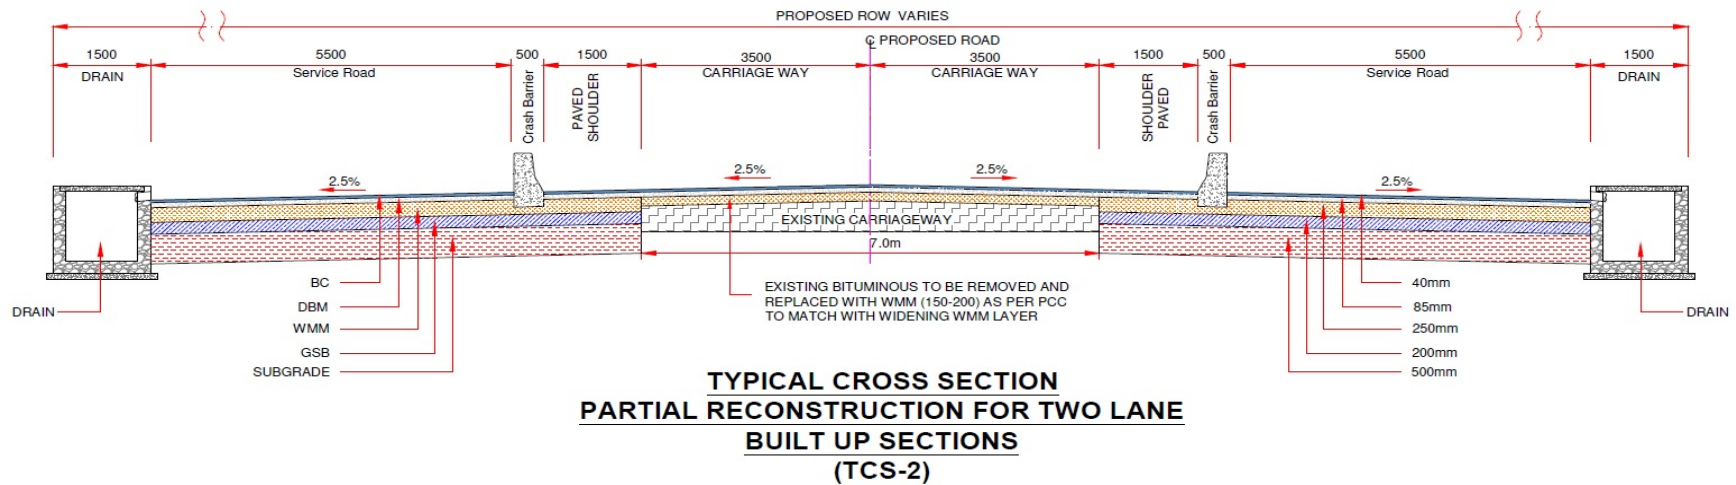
Typical Cross Section Partial Reconstruction for Two Lane in Built-up Section
